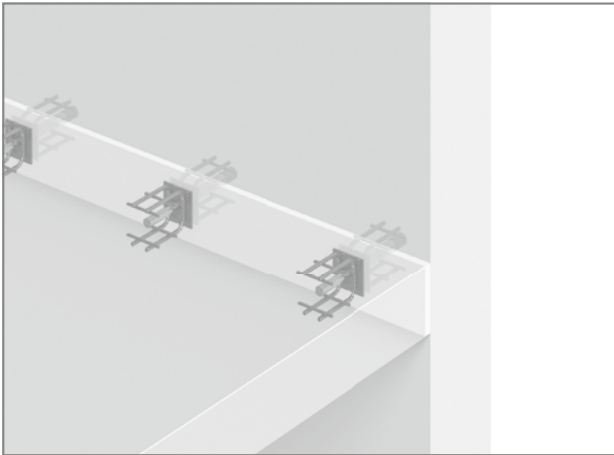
Schöck Dorn type SLD-Q: Connection slab-wall
